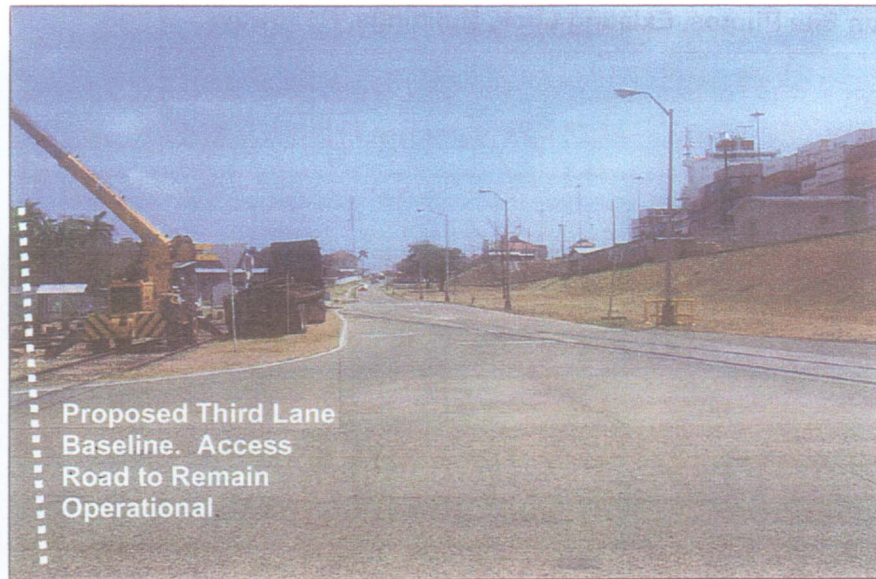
Access Road Adjacent To The Gatun East Wall
